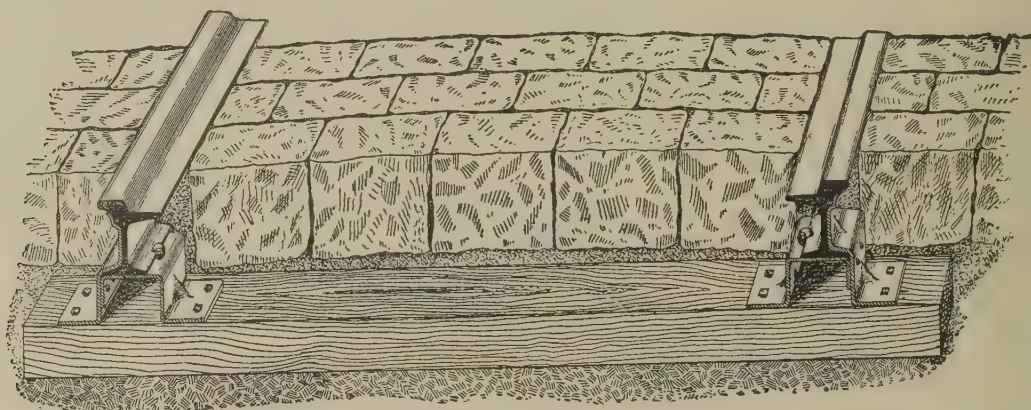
CROSS SECTION STREET CONSTRUCTION, GIRDER RAIL, WROUGHT BRACE CHAIR, MARSHALL CLIPS.
